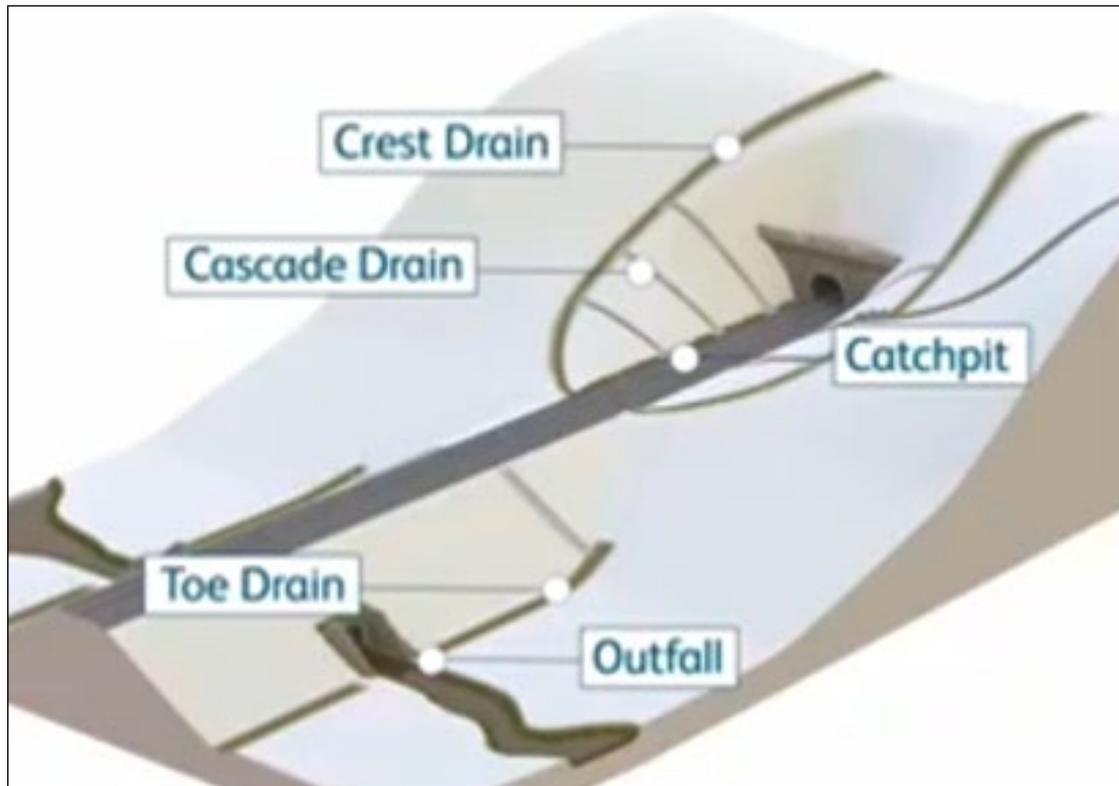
NR Drainage System that collects surface and groundwater running towards, falling onto or issuing from the railway, delivering water to a suitable outfall. (after NR Drainage Asset Policy NR (2017c))
